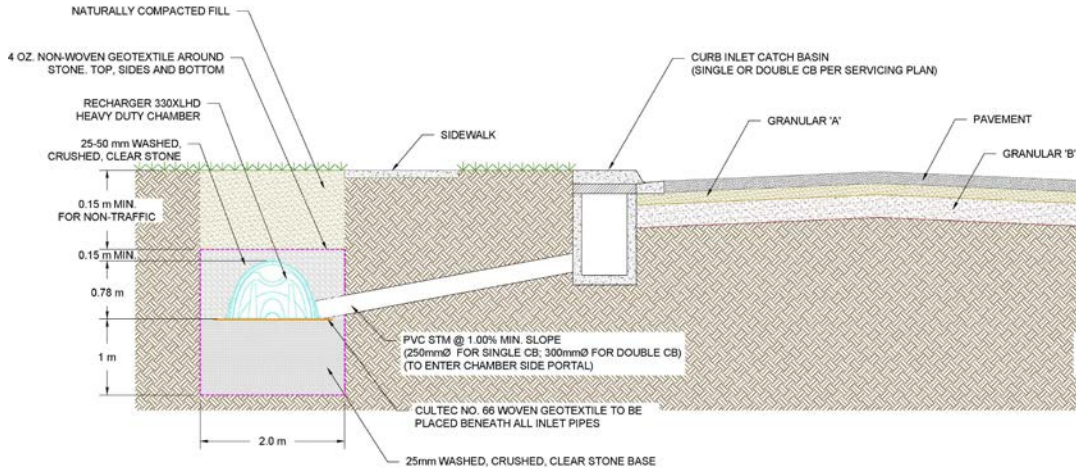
Sewerless Road Conceptual Road Cross-Section (Region of Peel, 2016)
